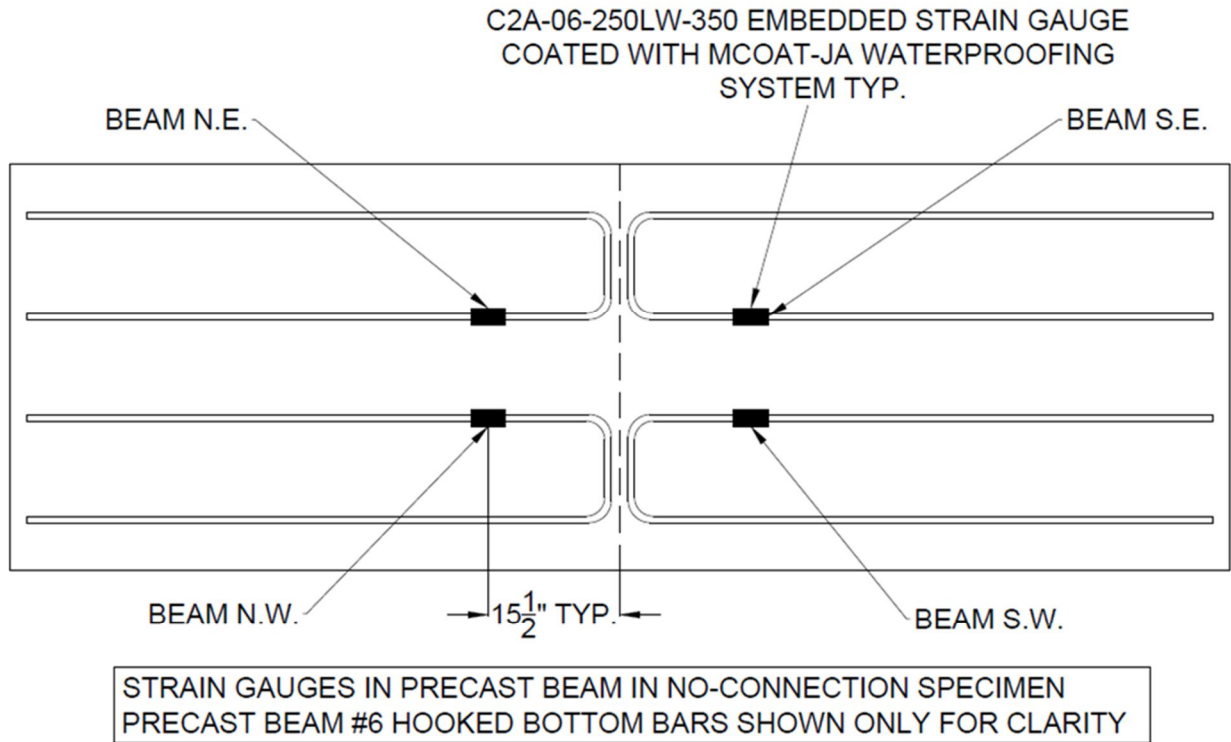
Plan view on precast beam portion of subassembly, showing embedded strain gauge locations
